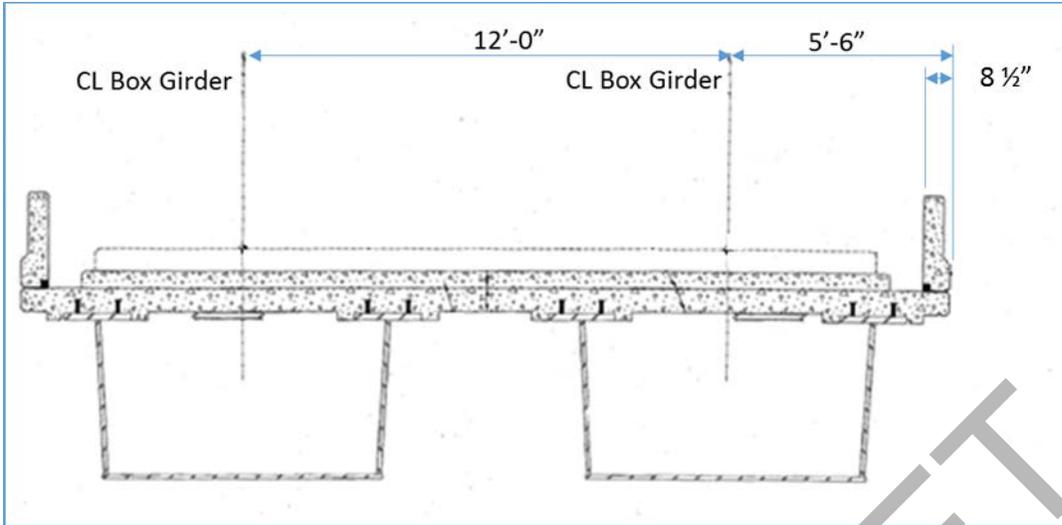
CROSS SECTION OF BOX GIRDERS
